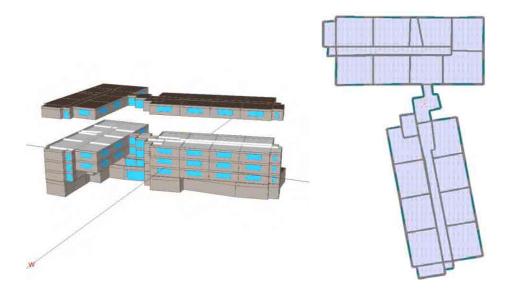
High Rise Building Energy Model 3D View and Floor Plan
